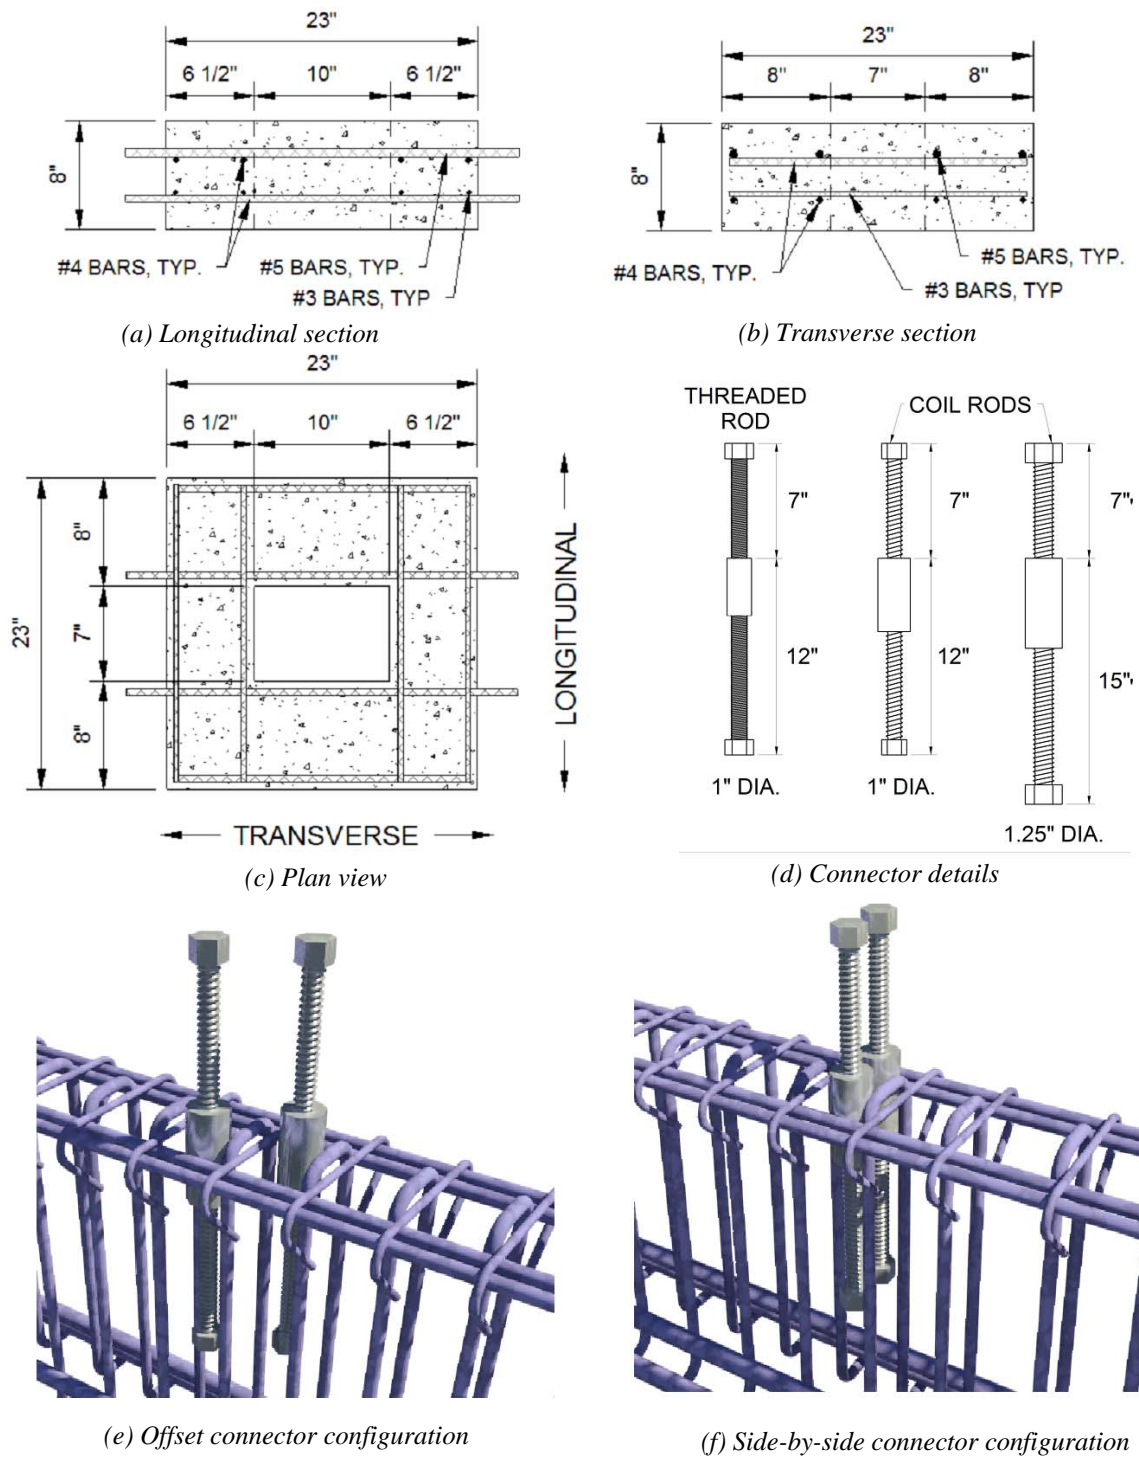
Reinforcing details for deck specimens and details for connector specimens.
